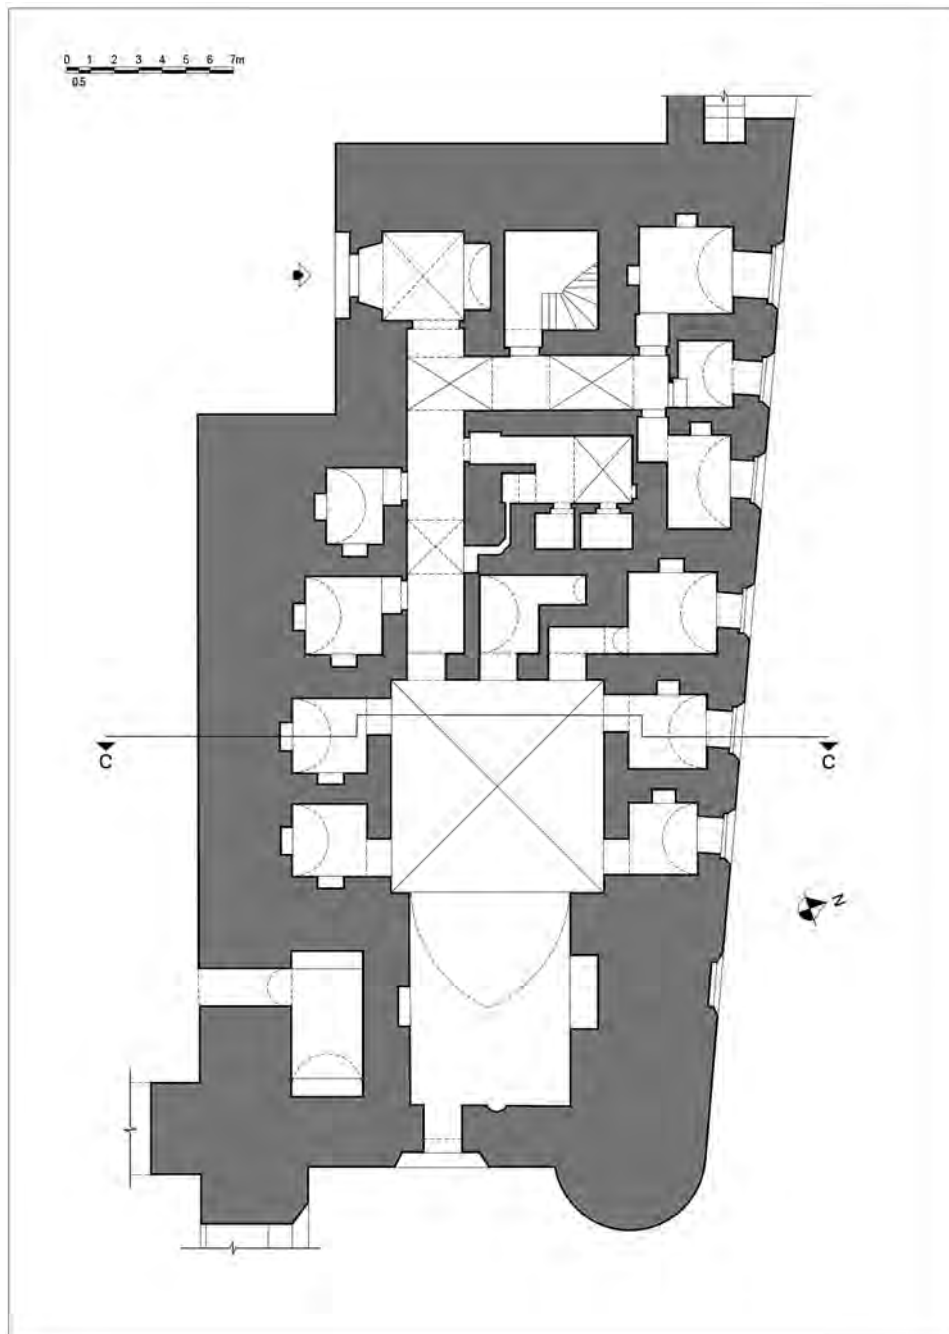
Shāfiʿiyah Madrasah, Complex of Sultan Ḥasan, Cairo, ground floor plan (H. Al-Harithy)
